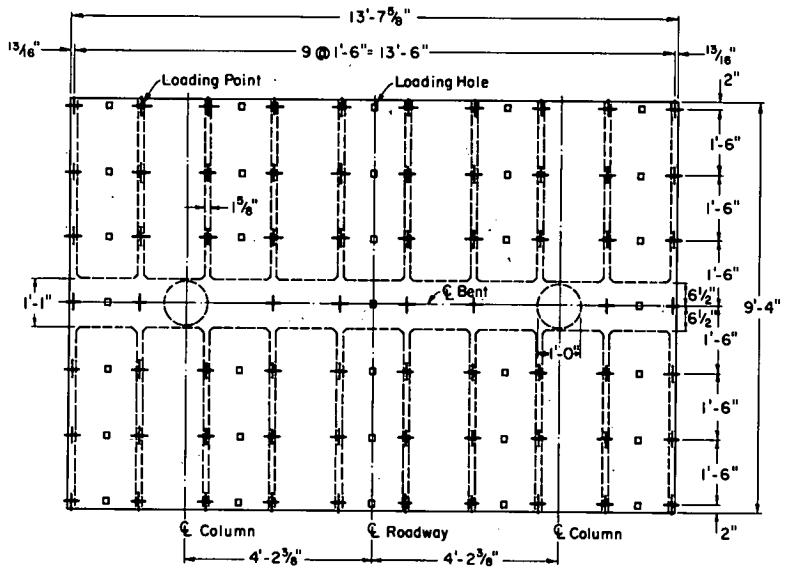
Plan of Double-Column Bent Cap Specimen DC-9
